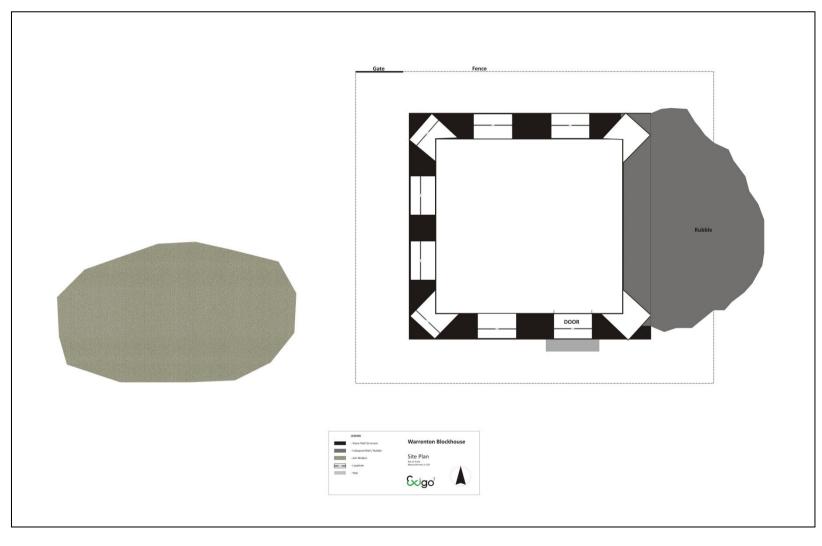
Site Plan for the Warrenton Blockhouse Restoration project area.
